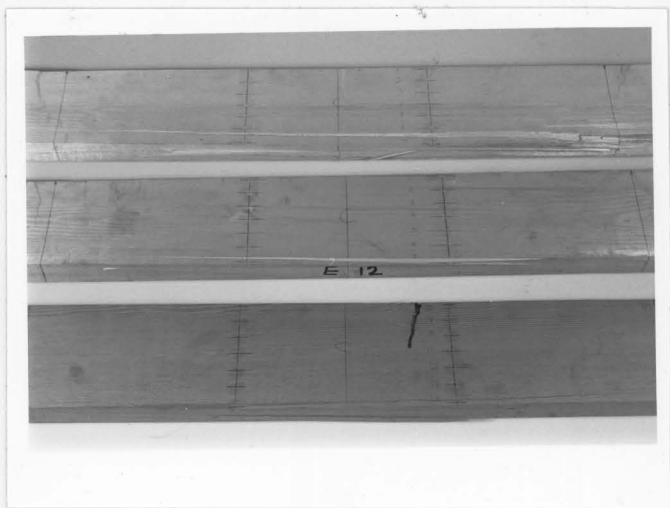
TYPICAL FAILURE IN 2 x 6 CLEAR BEAMS SUBJECTED TO THIRD-POINT LOADING
